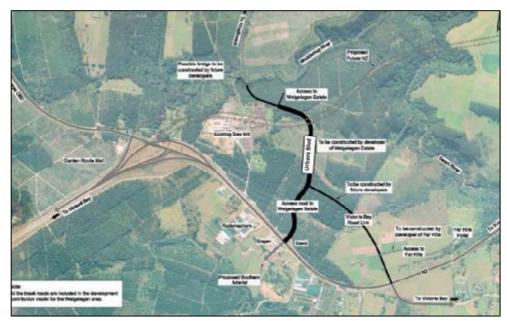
EXTRACT - WELGELEGEN ROADS MASTER PLAN (2008)
